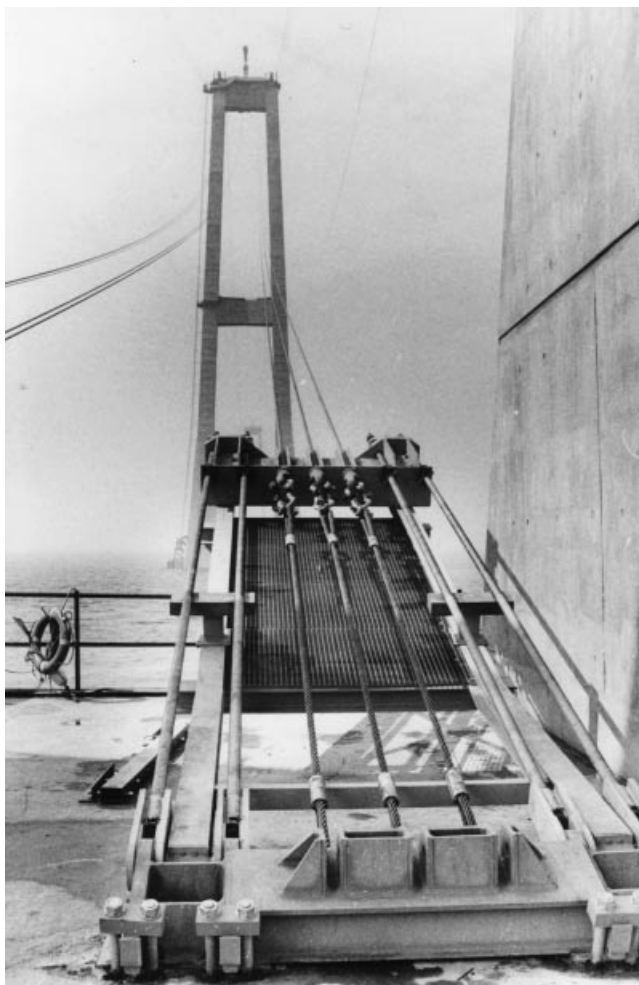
Bracing cables installed to stabilize the concrete pylons of the Lillebælt Bridge
